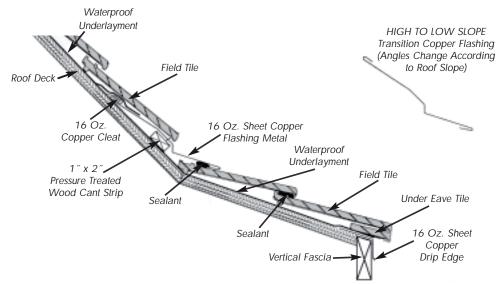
Flashing at Low Slope to High Slope (for Interlocking Tile)
